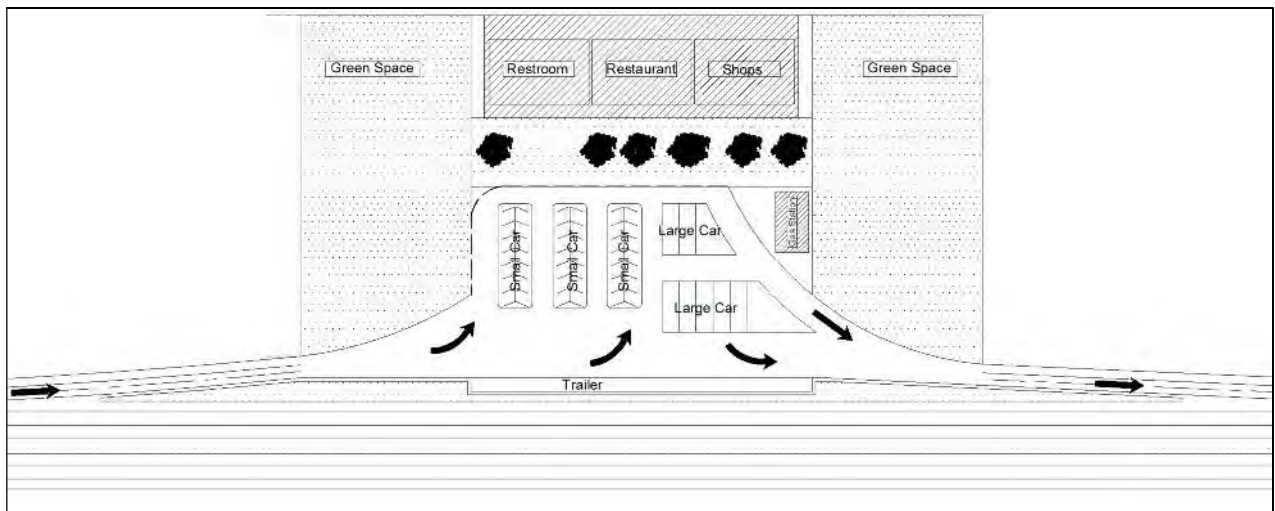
Example of Layout of Facilities of Rest Area
